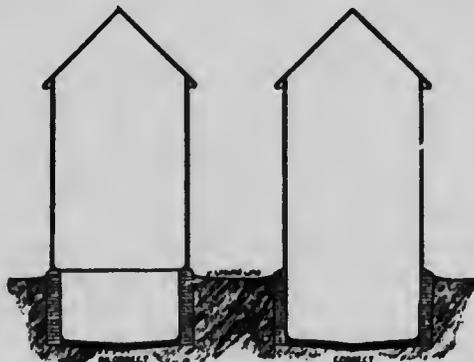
Correct and incorrect methods of constructing silo foundations.
